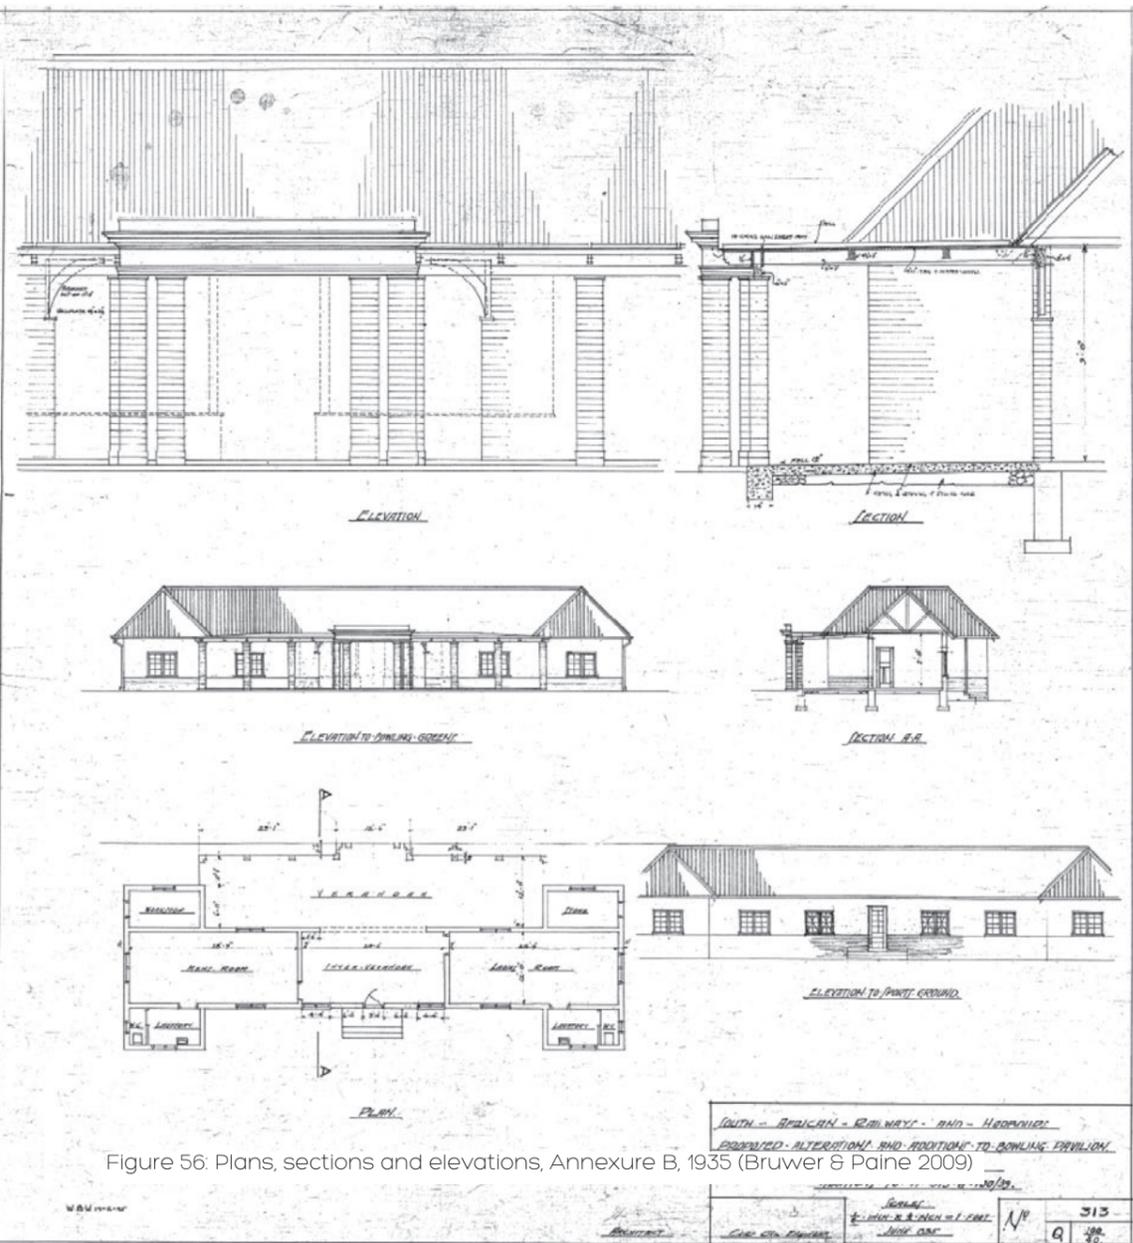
Plans, sections and elevations, Annexure B, 1935 (Bruwer & Paine 2009)
